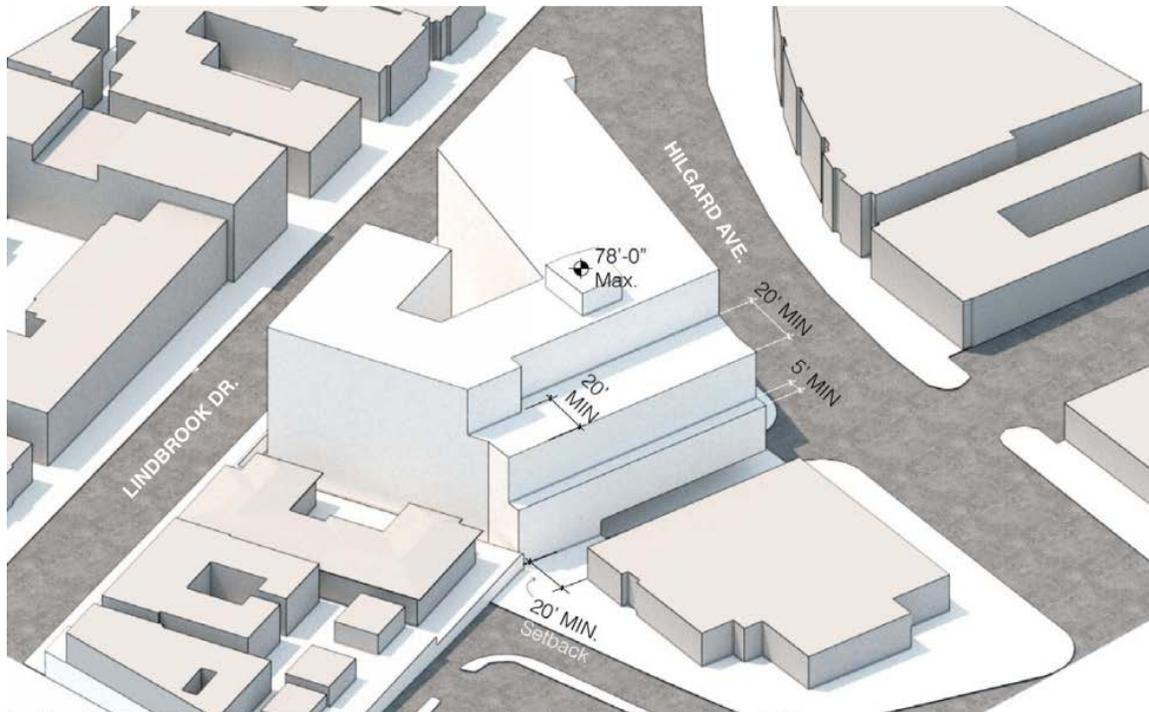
Massing diagram showing fit study with setbacks at north façade adjacent to the church.
